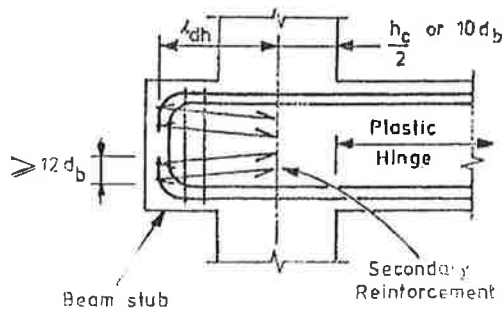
ANCHORAGE OF BEAM BARS IN A BEAM STUB
